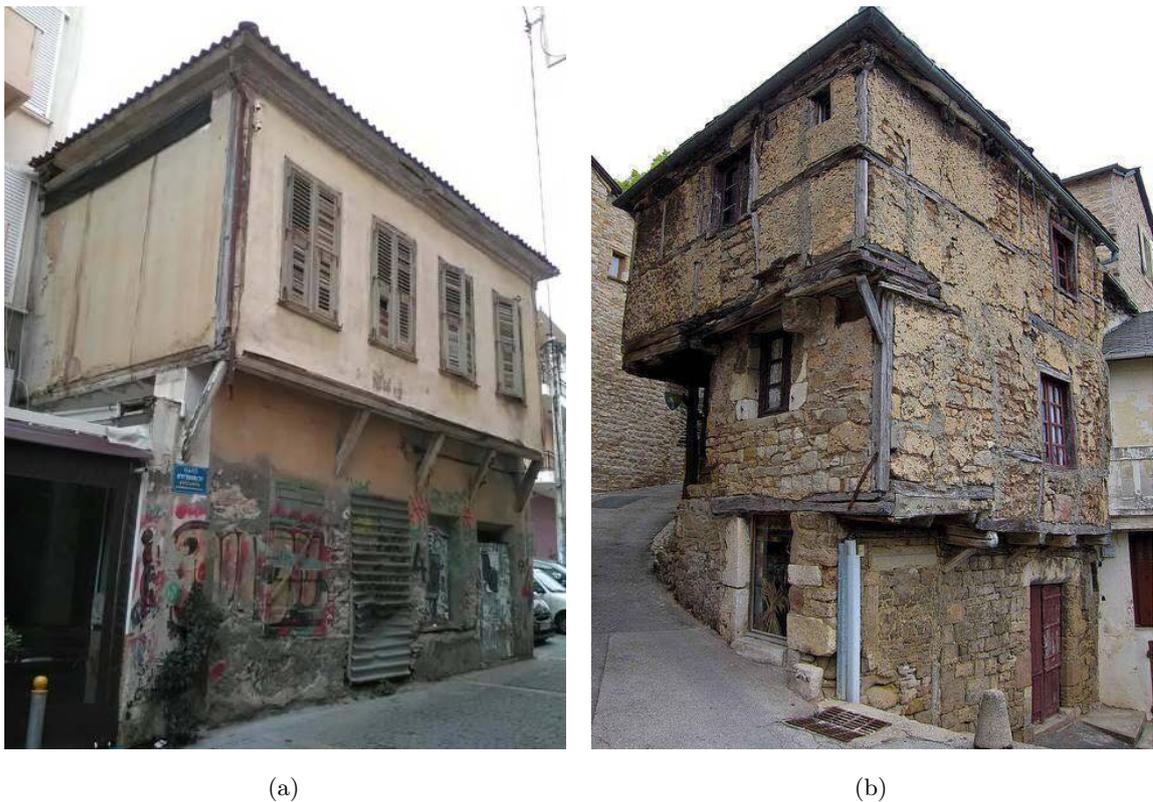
Isolated damaged masonry building within the surrounding built context.
